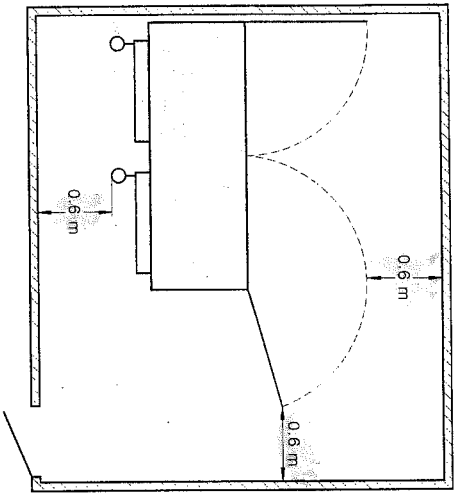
ACCESS TO SWITCHBOARDS— SWITCHBOARD WITH ONE END AGAINST WALL
